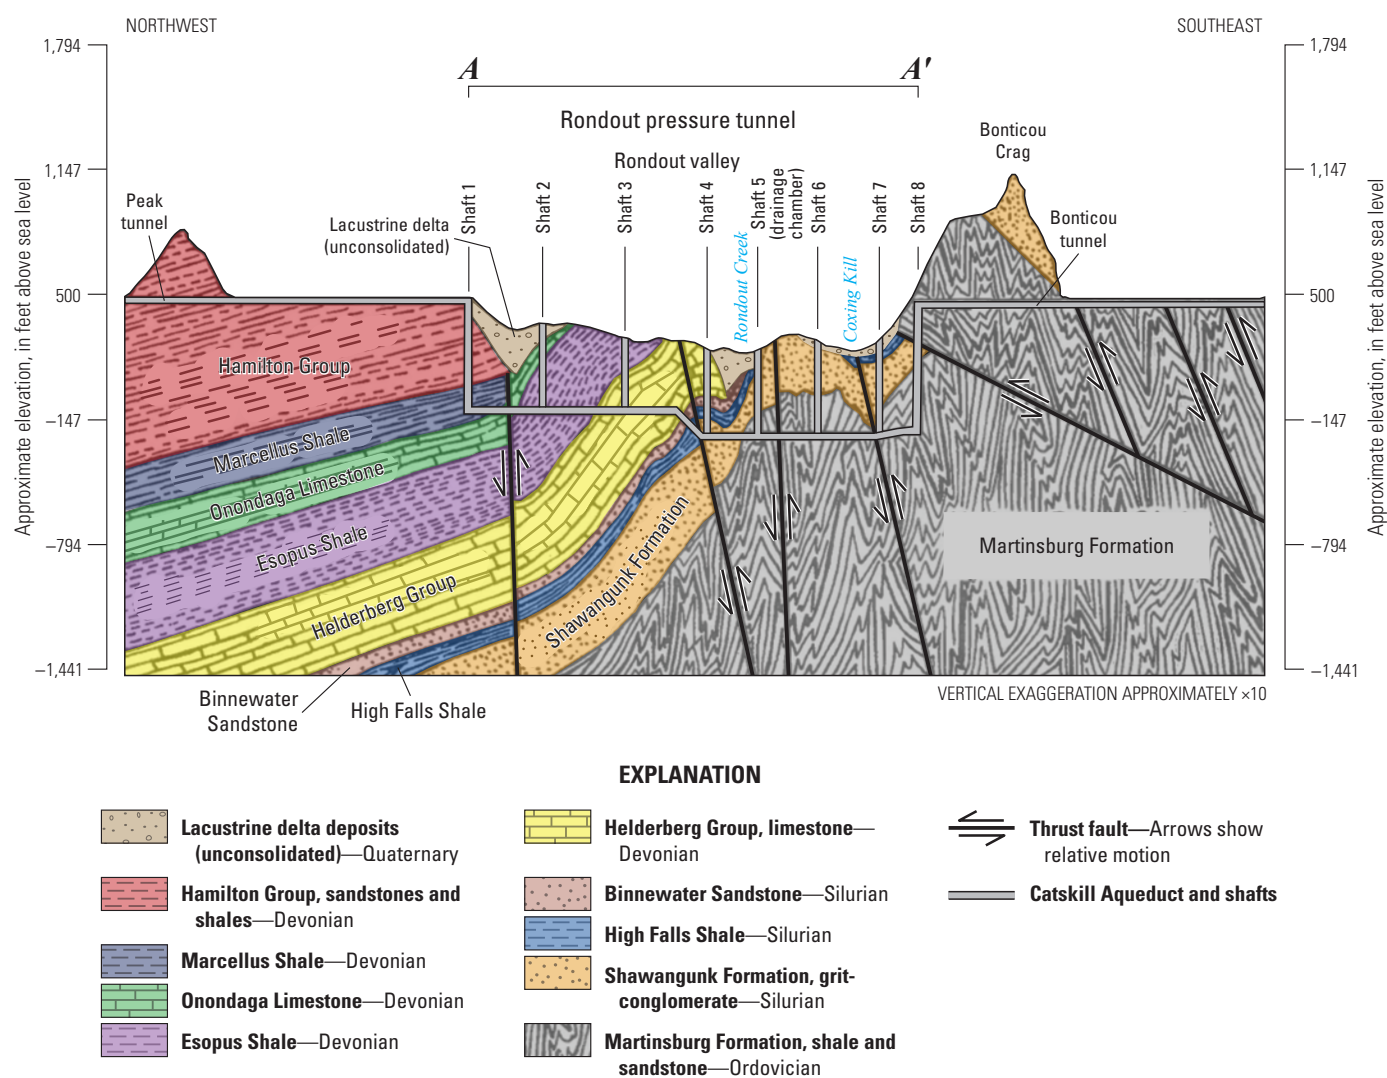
Cross section of the geology along the Rondout pressure tunnel line beneath the Rondout valley, Ulster County, New York (modified from Fluhr and Terenzio, 1984). The Rondout pressure tunnel, located between shafts 1 and 8, is shown on sheets 1–3. (The thin veneer of sediment in the Coxing Kill area is not shown on map sheets because it has no significance to water-bearing units.)
